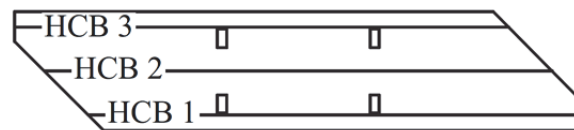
Ahsan's Test 3 Load Configuration (Ahsan, 2012) Used under fair use, 2013
